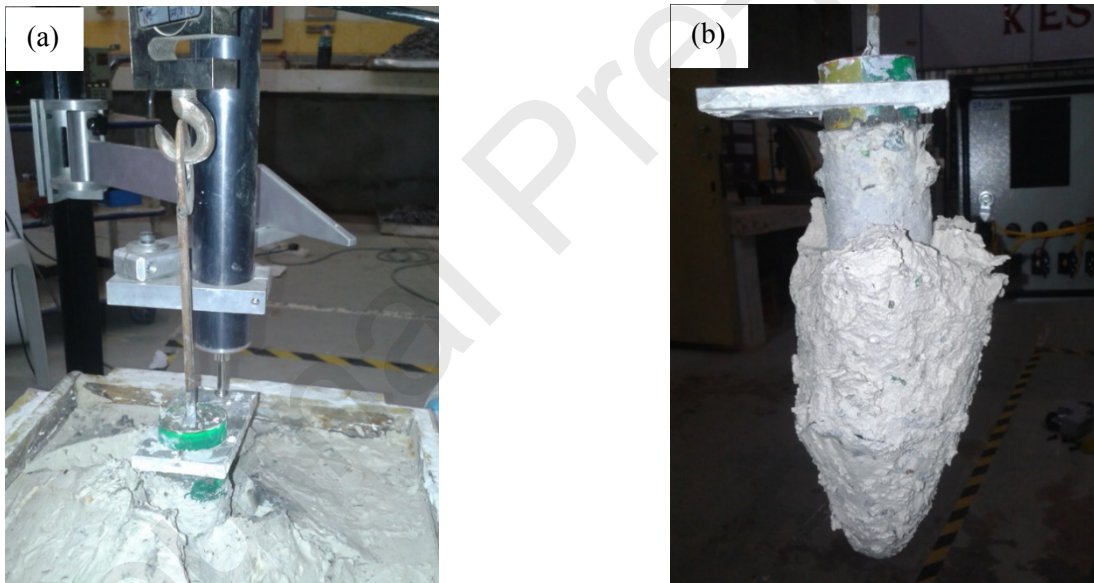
(a) Failure moment of the pile (b) Failed pile from pull-out test
